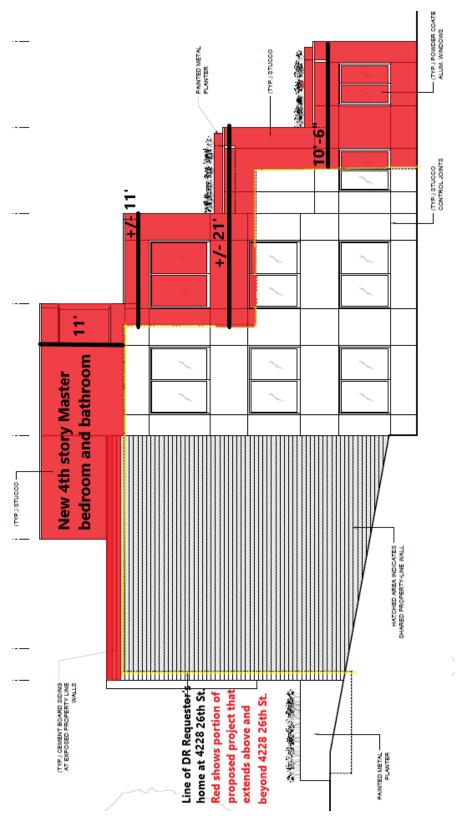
Substantial Horizontal and Vertical Expansion Proposed Far Beyond the McAlister's Home
